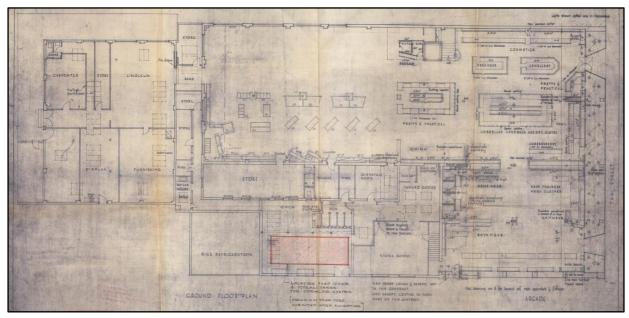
Detail from 1963 plans showing the alterations to the ground floor plan of the DIC building (Smith, Rice, & Lawrence, 1963).
